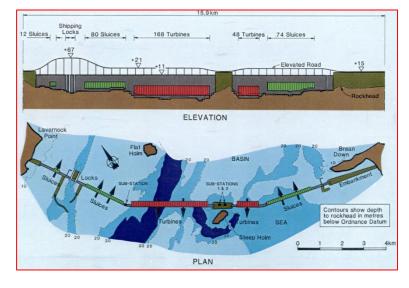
Cardiff to Weston Elevation and Plan imagery from STPG.
